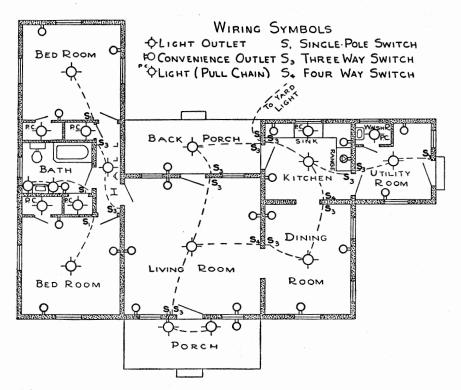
Floor plan of farm house showing location of various kinds of outlets.
